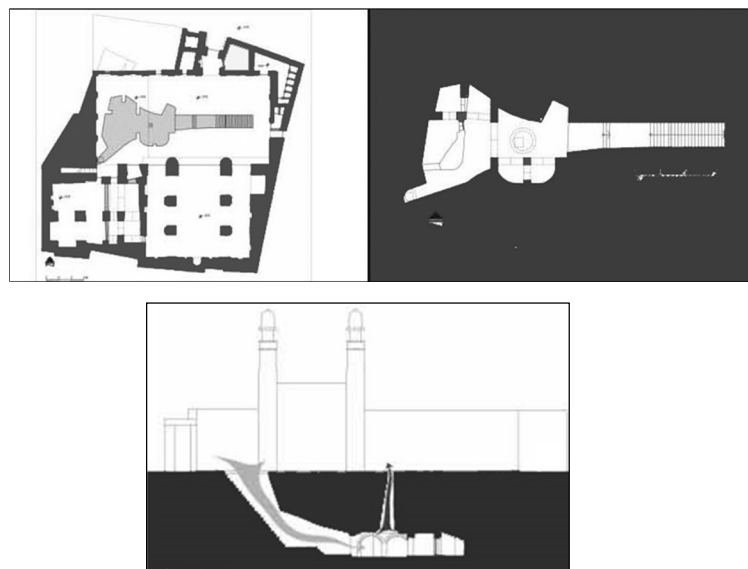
(Bld. 03) Lab-e-Khandagh Mosque, Left: Ground floor plan and the plan of the underground space. Right: Section. Shavadan's entrance and long narrow shaft, providing natural ventilation, circulate the air inside Shavadan to the outside (without scale)
